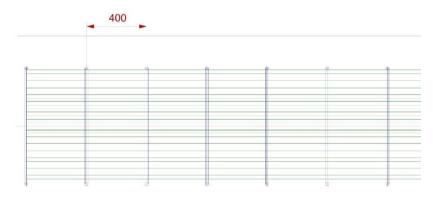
Zoomed in longitudinal section of the pile. Units in mm.
